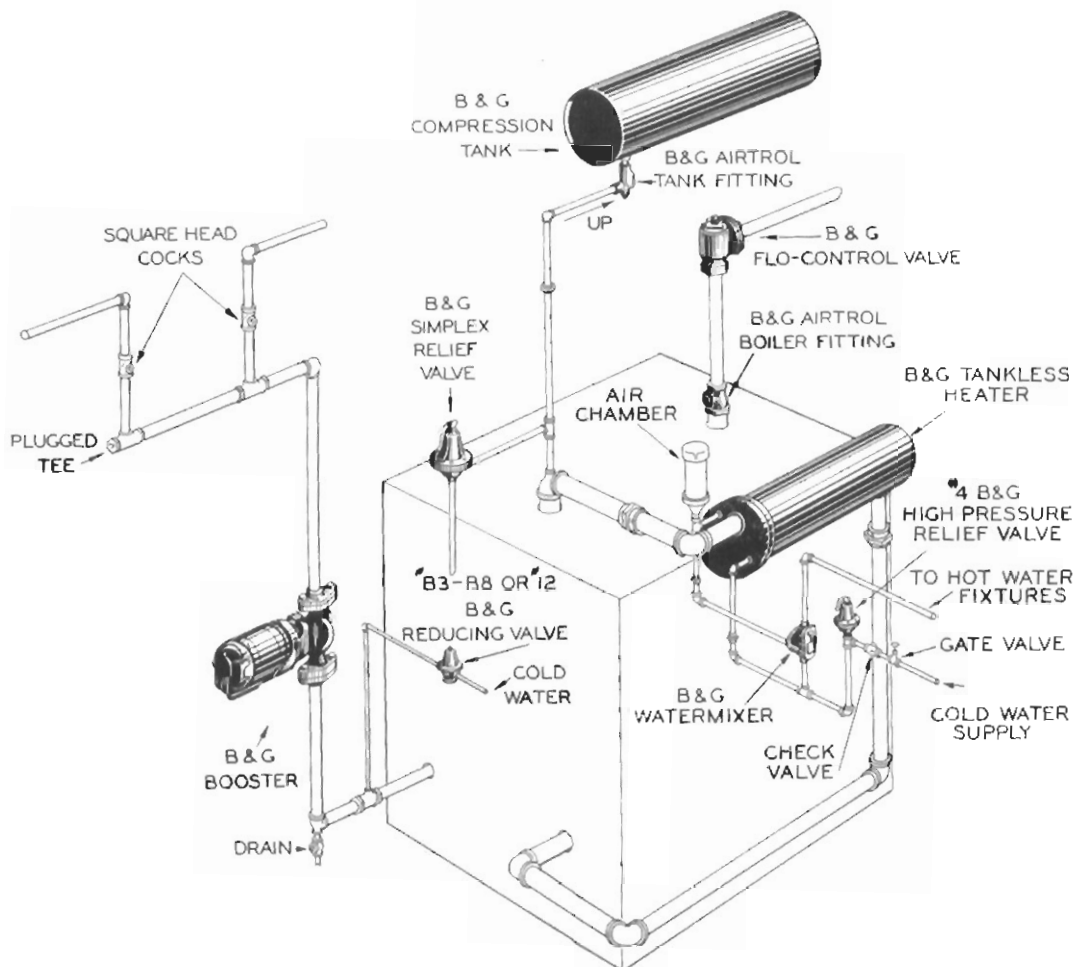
B & G No. 20 or 30 Tankless Heater installed on a hot water boiler.
